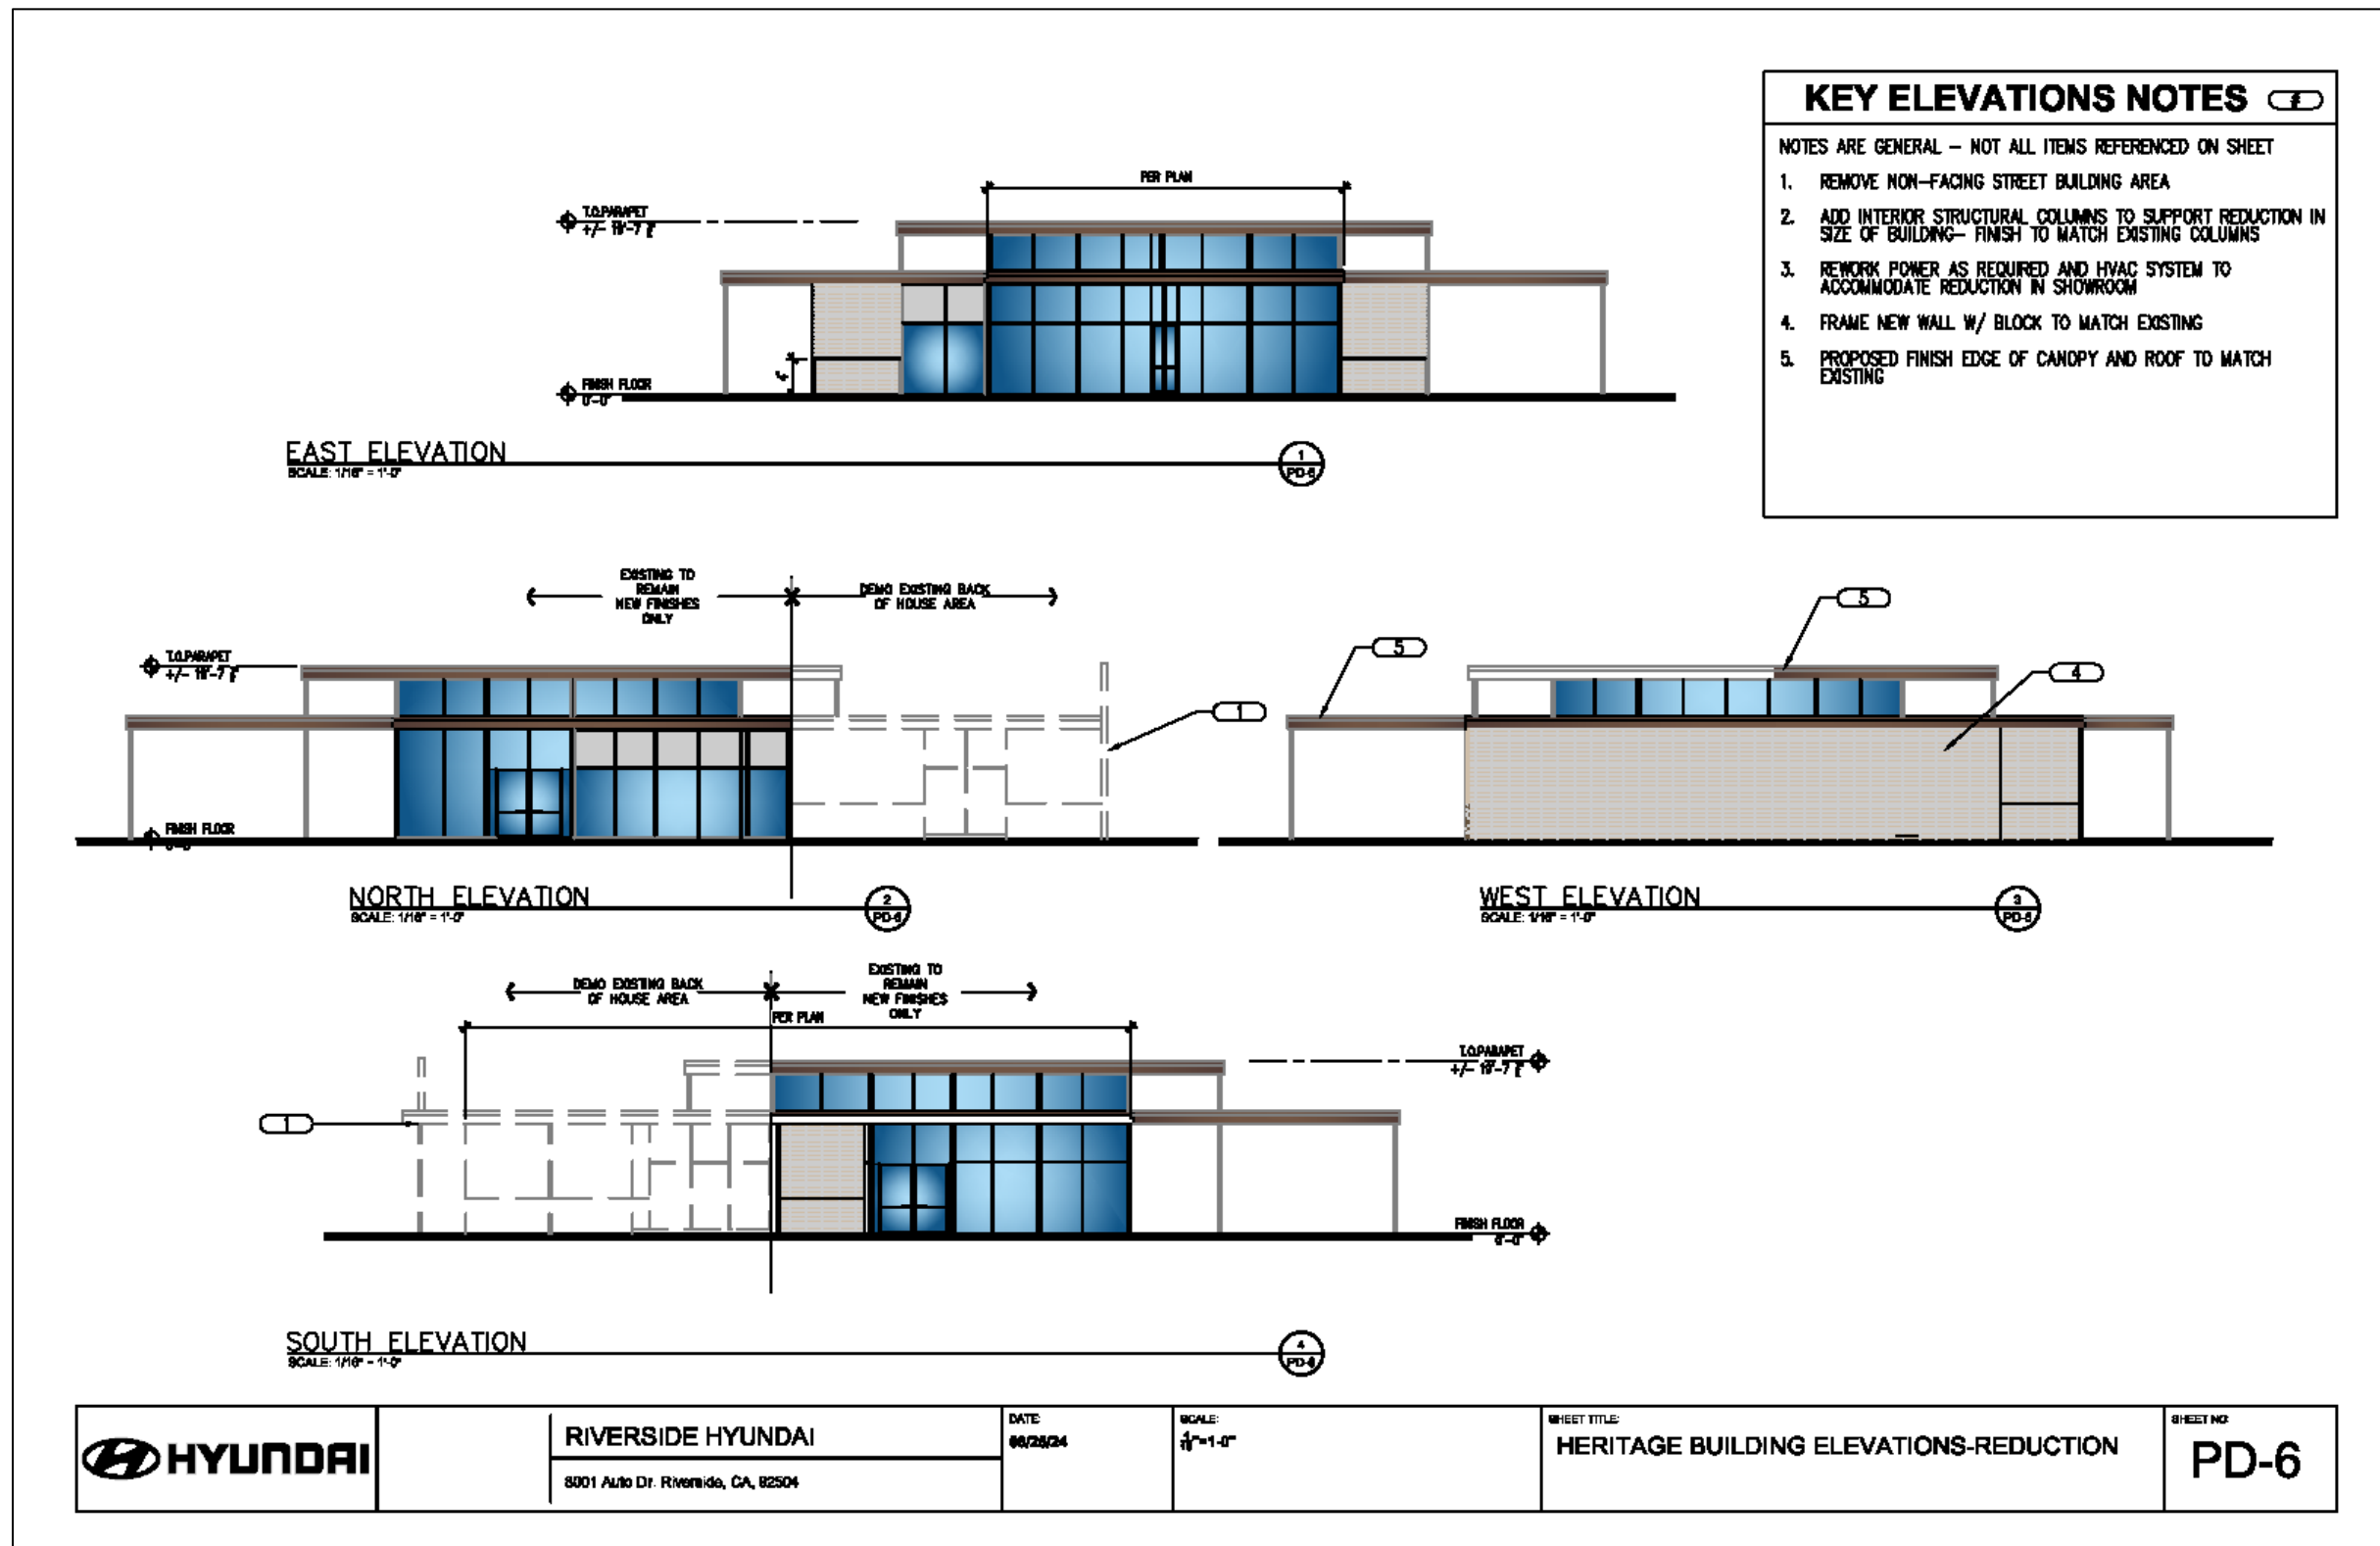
Proposed Plans for Building Reduction (Provided by Mike Khoury).
